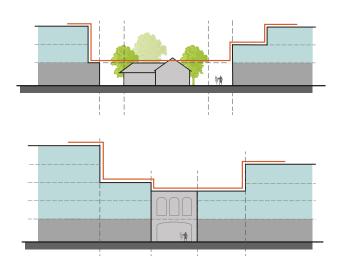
Section D - Proposed building envelopes for Waterview Street site exhibited for comment
